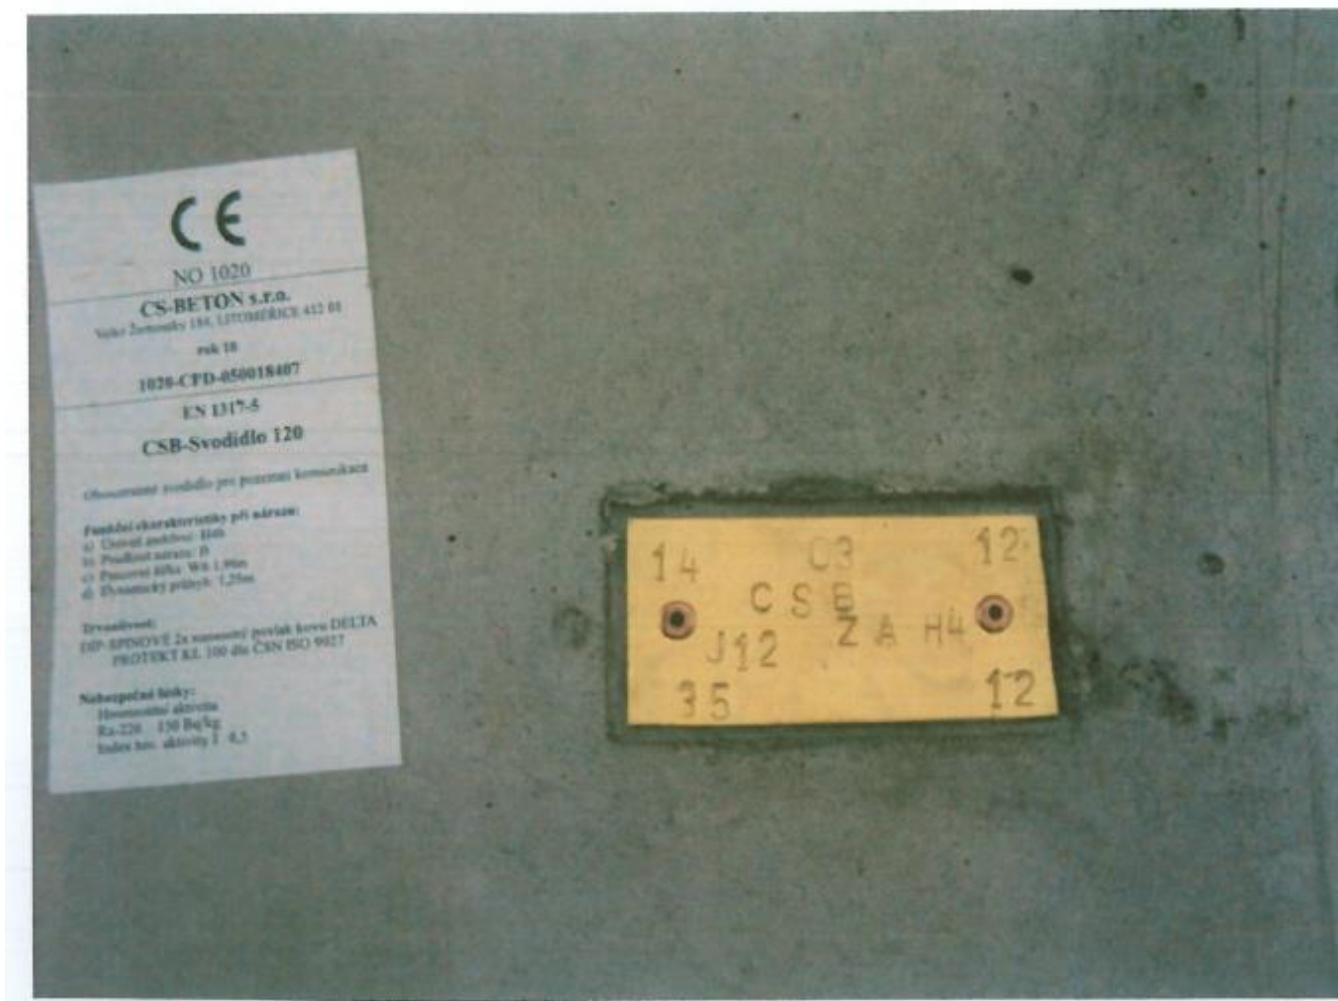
CE label and brass label for concrete barrier marking CS BETON
